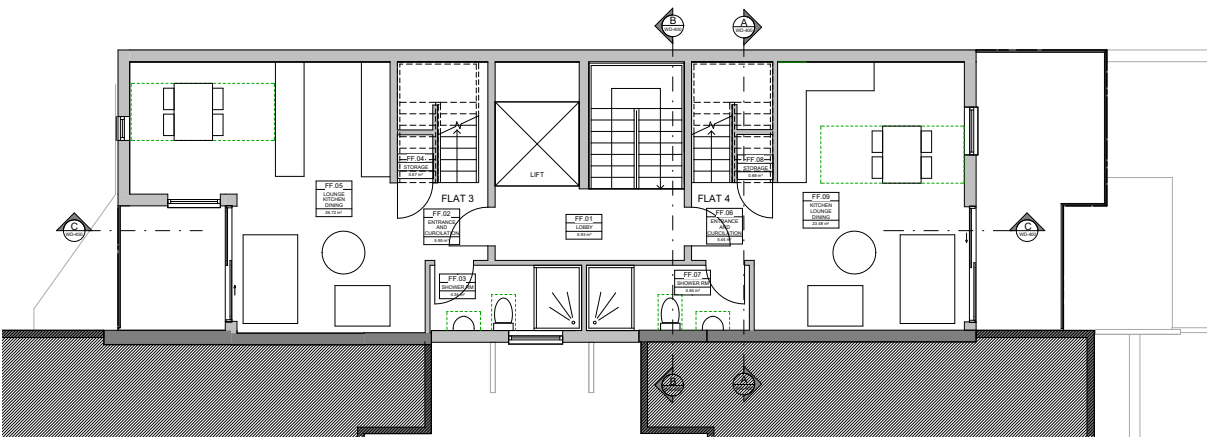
BLOCK 2 MAISONETTES APPROVED FLOOR PLANS
